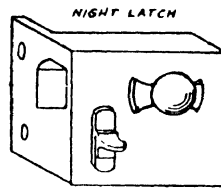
shows a *rim lock* which is fixed on the face of a door, and has a projecting flange or rim passing across and screwed on its edge.
